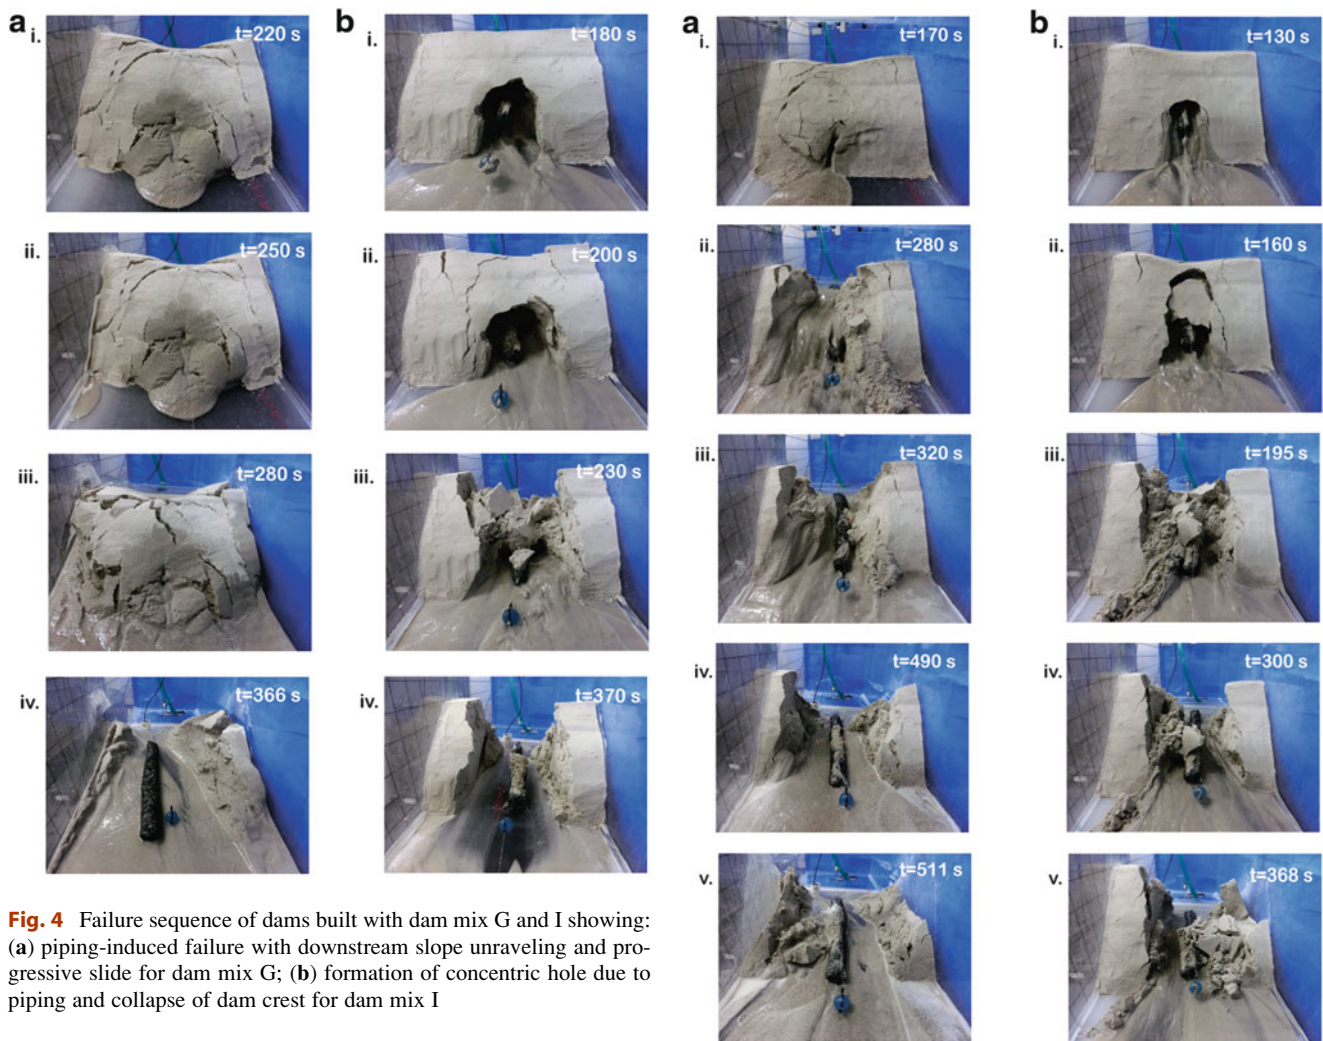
Failure sequence of dams built with dam mix G and I showing: (a) piping-induced failure with downstream slope unraveling and progressive slide for dam mix G; (b) formation of concentric hole due to piping and collapse of dam crest for dam mix I
